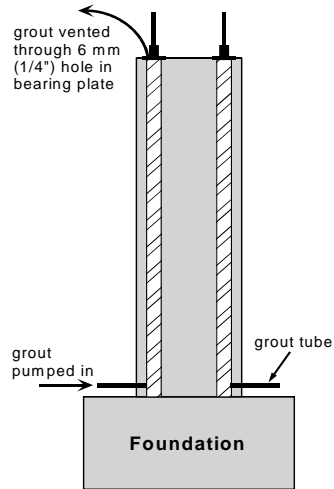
Inlet and Vent for Grouting<sup>2</sup>
